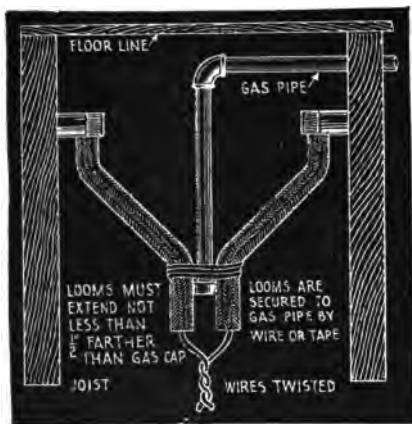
,203.—Method of making a ceiling outlet for a combination gas and electric fixture.
